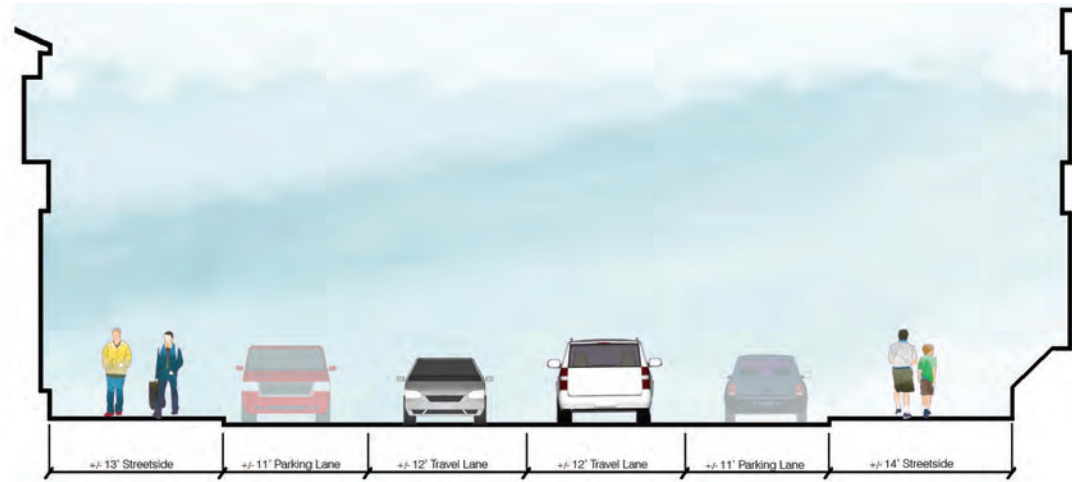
Jones Existing Cross Section – Alamo to Broadway
